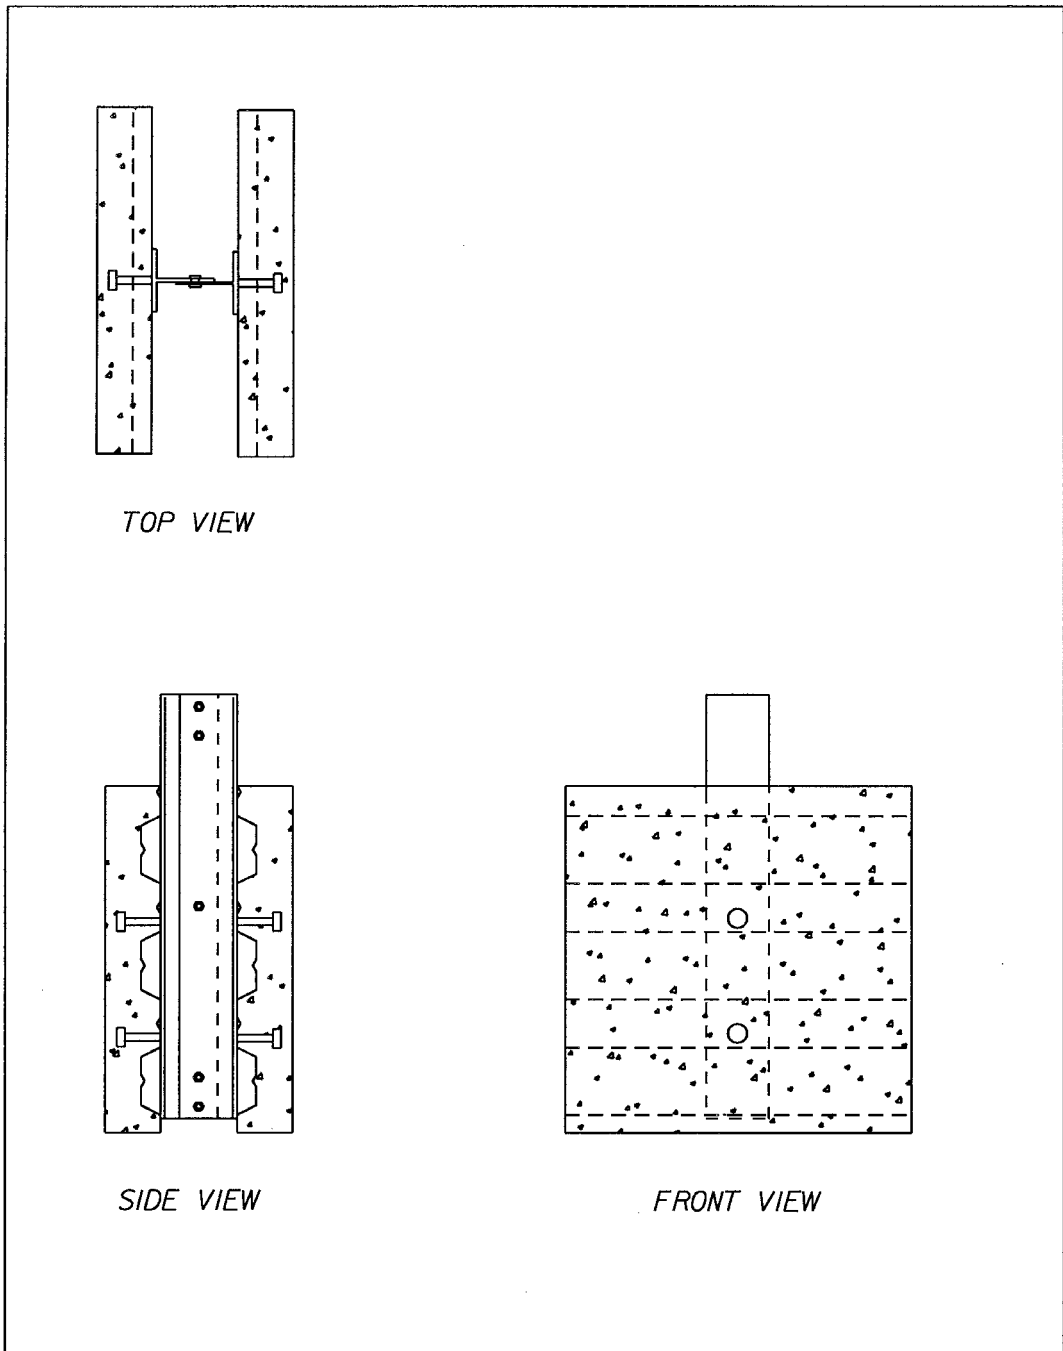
Composite Slab Push-Out Specimen with Studs in the "Weak" Position (Welded Wire Fabric not shown)
